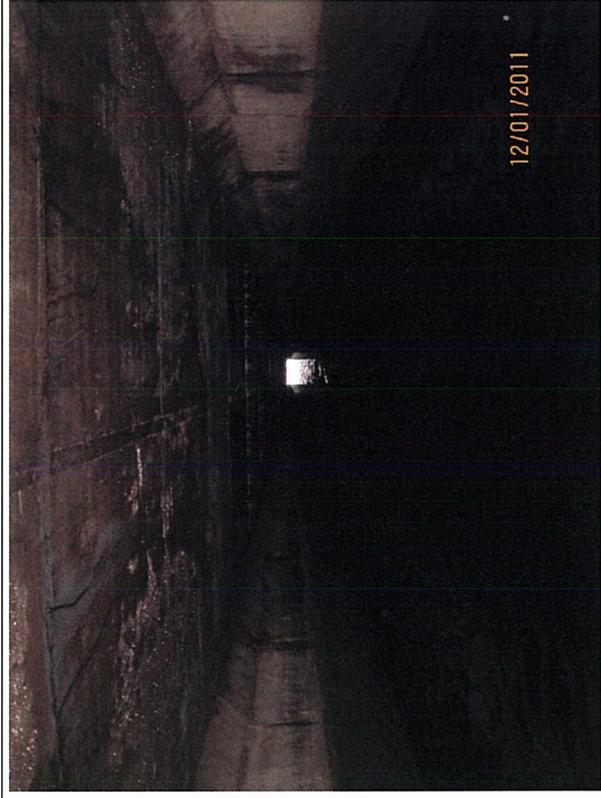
Looking south through BC1255 (culvert between Fleet St. and Lancaster St.)
